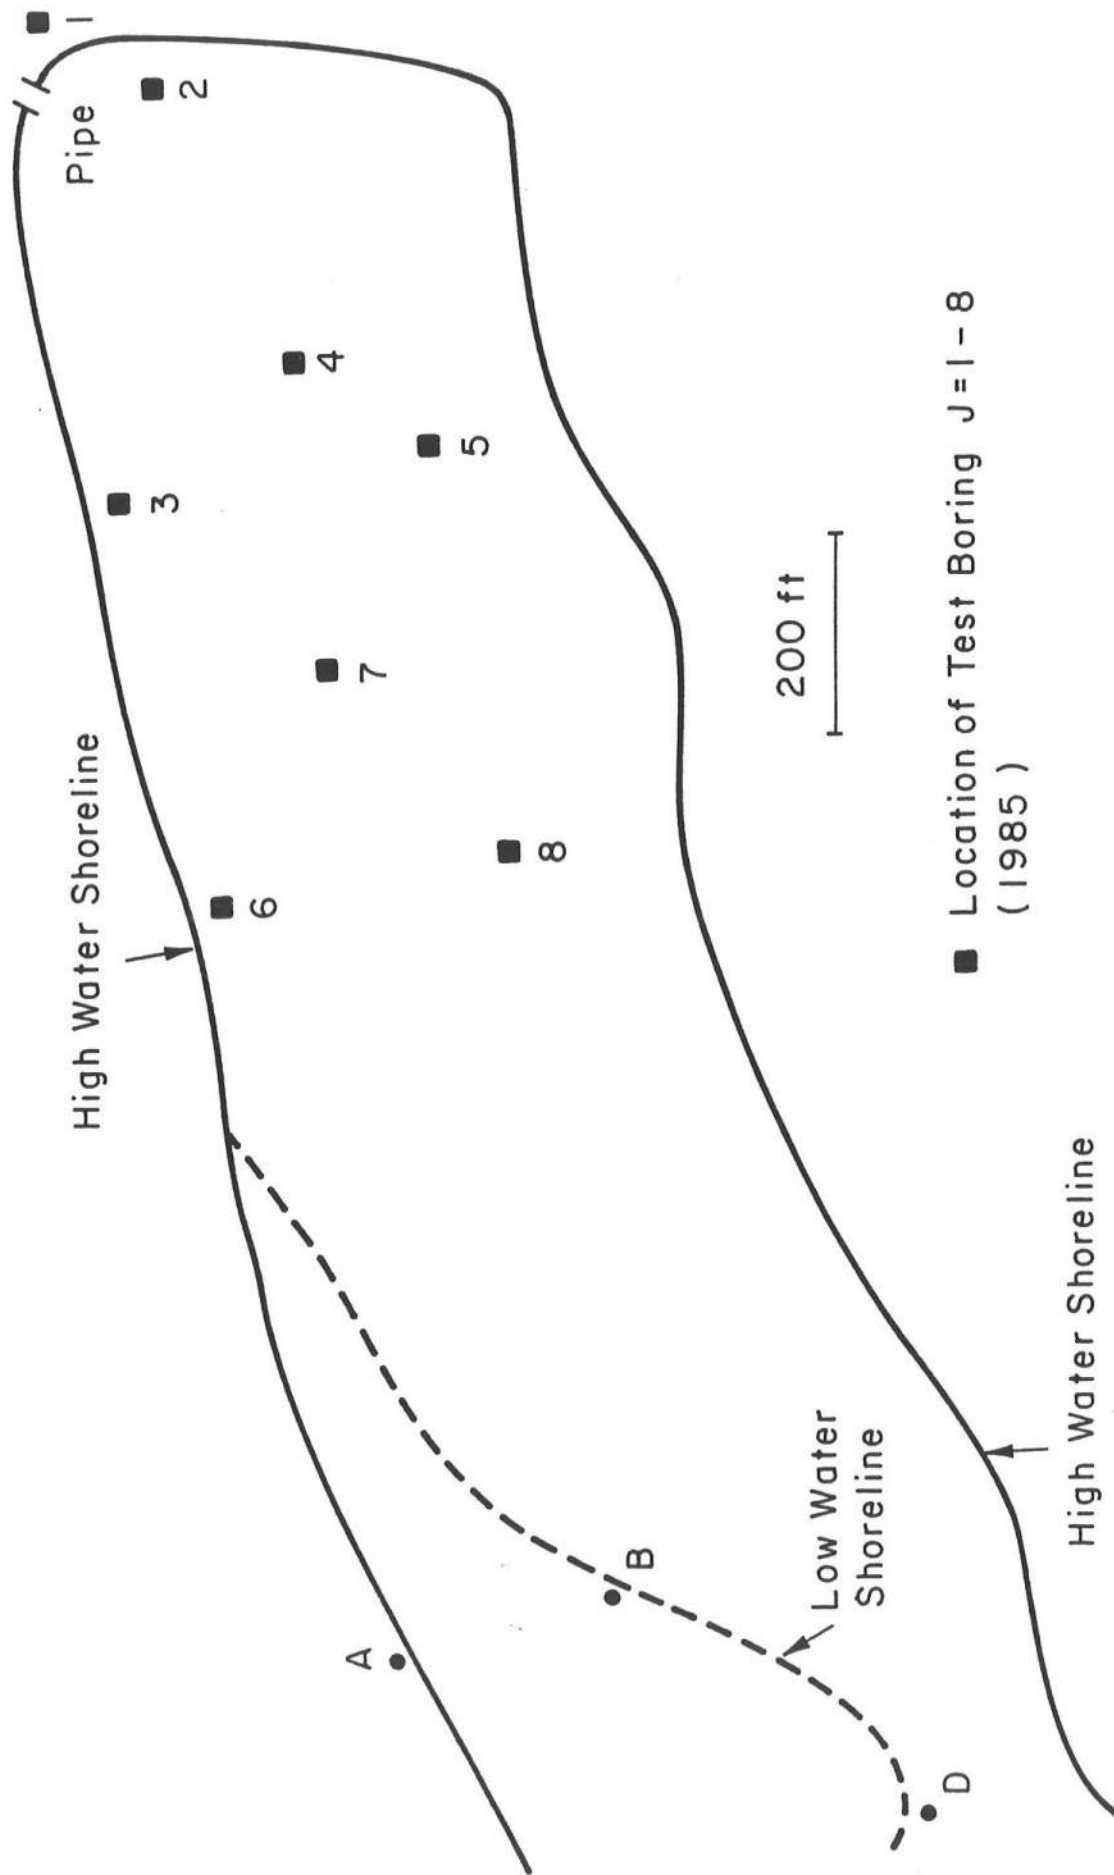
Locations of Test Borings Conducted in 1985 for Summit North Marina Site
